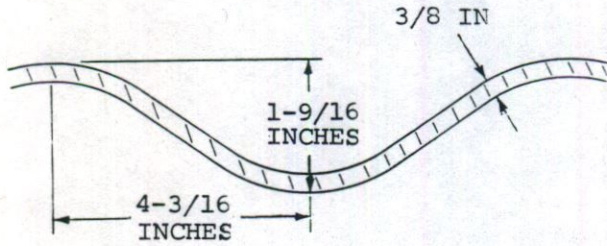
Corrugated Asbestos—Typical Cross Section
